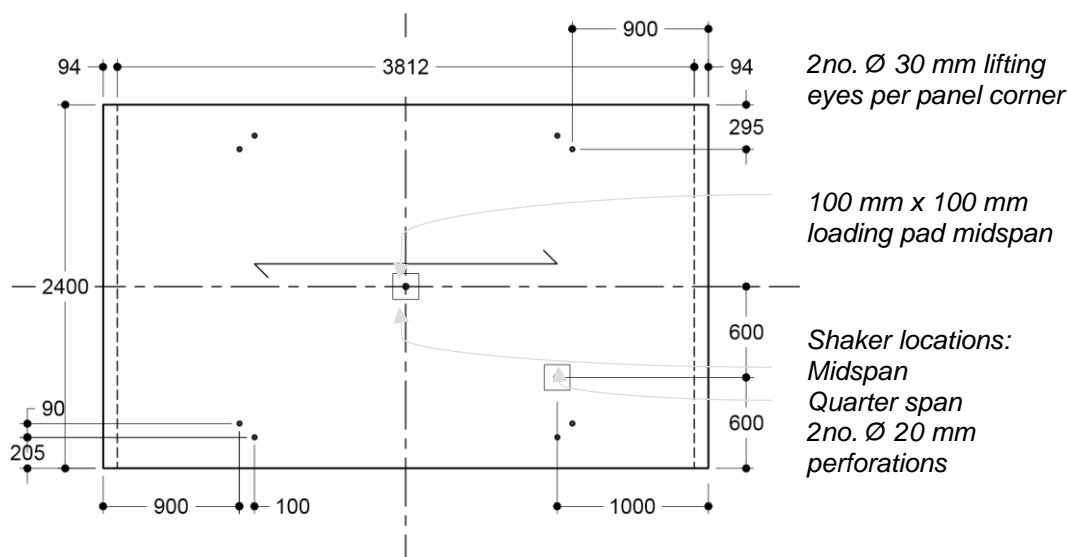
One-way long span platform construction with the shaker locations (Assemblies B, H, and D)
